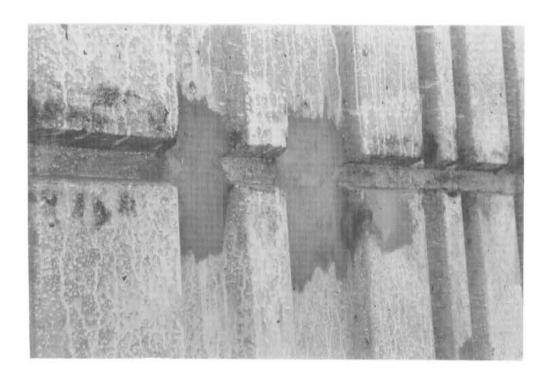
Patched Honeycombed Areas of the Southwest Wall.
